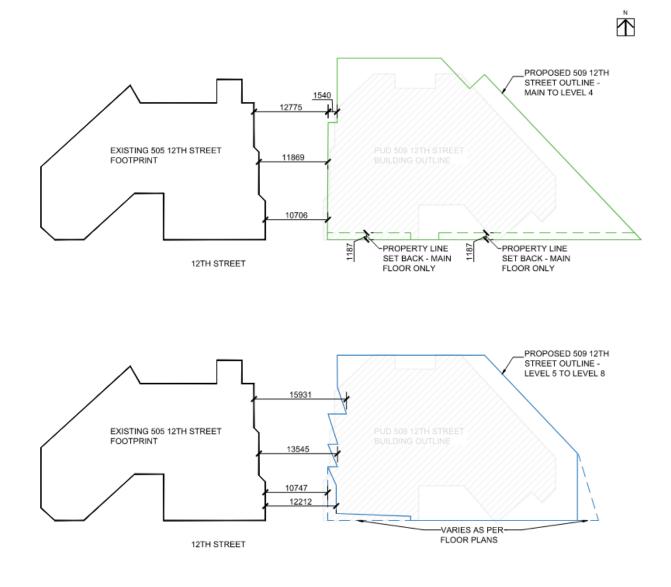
PROPOSED DEVELOPMENT SPACING TO EXISTING 505 12TH STREET EAST.
